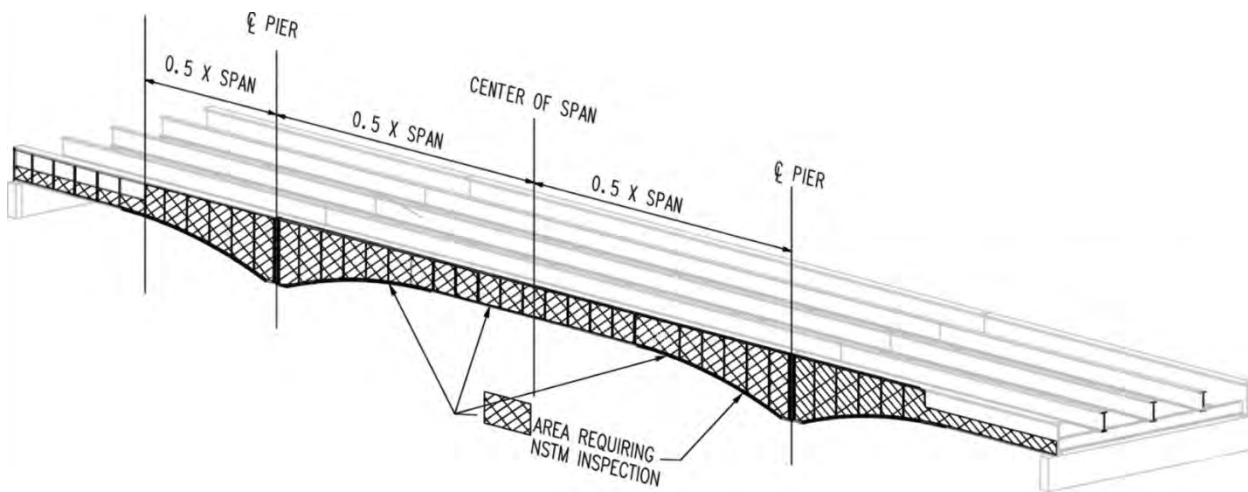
Main Girder Inspection without Field Splices or Longitudinal Stiffeners.
